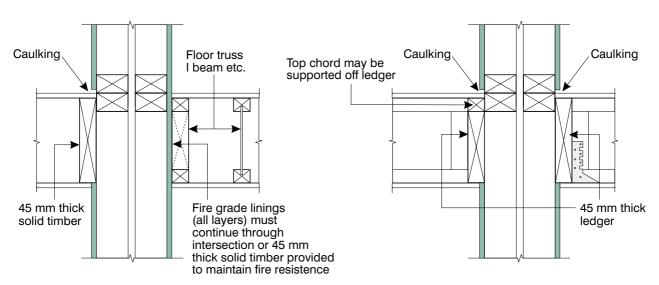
TWO STOREY DOUBLE STUD WALLS
